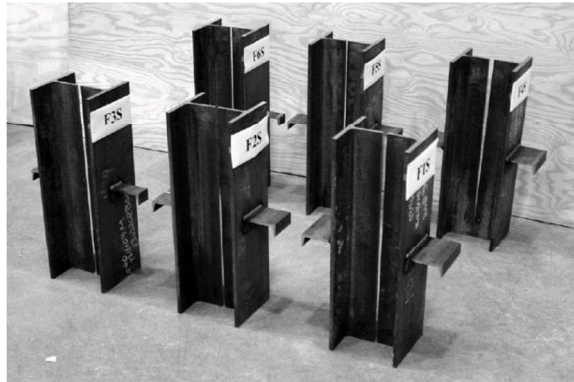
The I-beams cut to place concrete decks at the same time (Pashan & Hosain, 2009)
